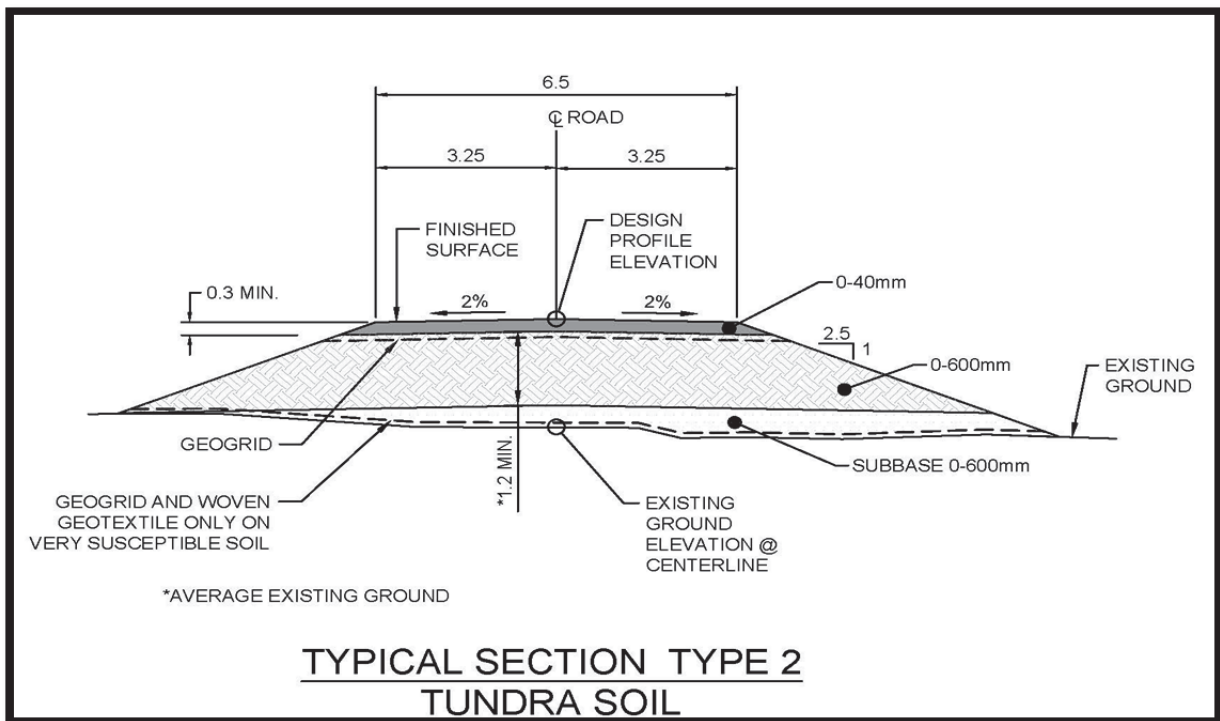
Typical Cross-section of Amaruq road built over thaw susceptible soil
